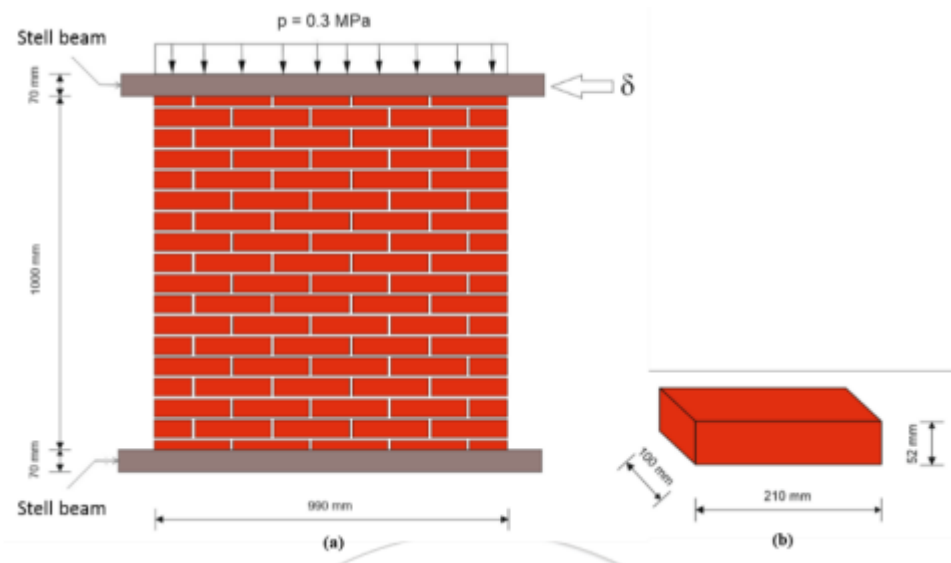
(a) Masonry wall geometry (b) masonry unit used in the wall [11]
